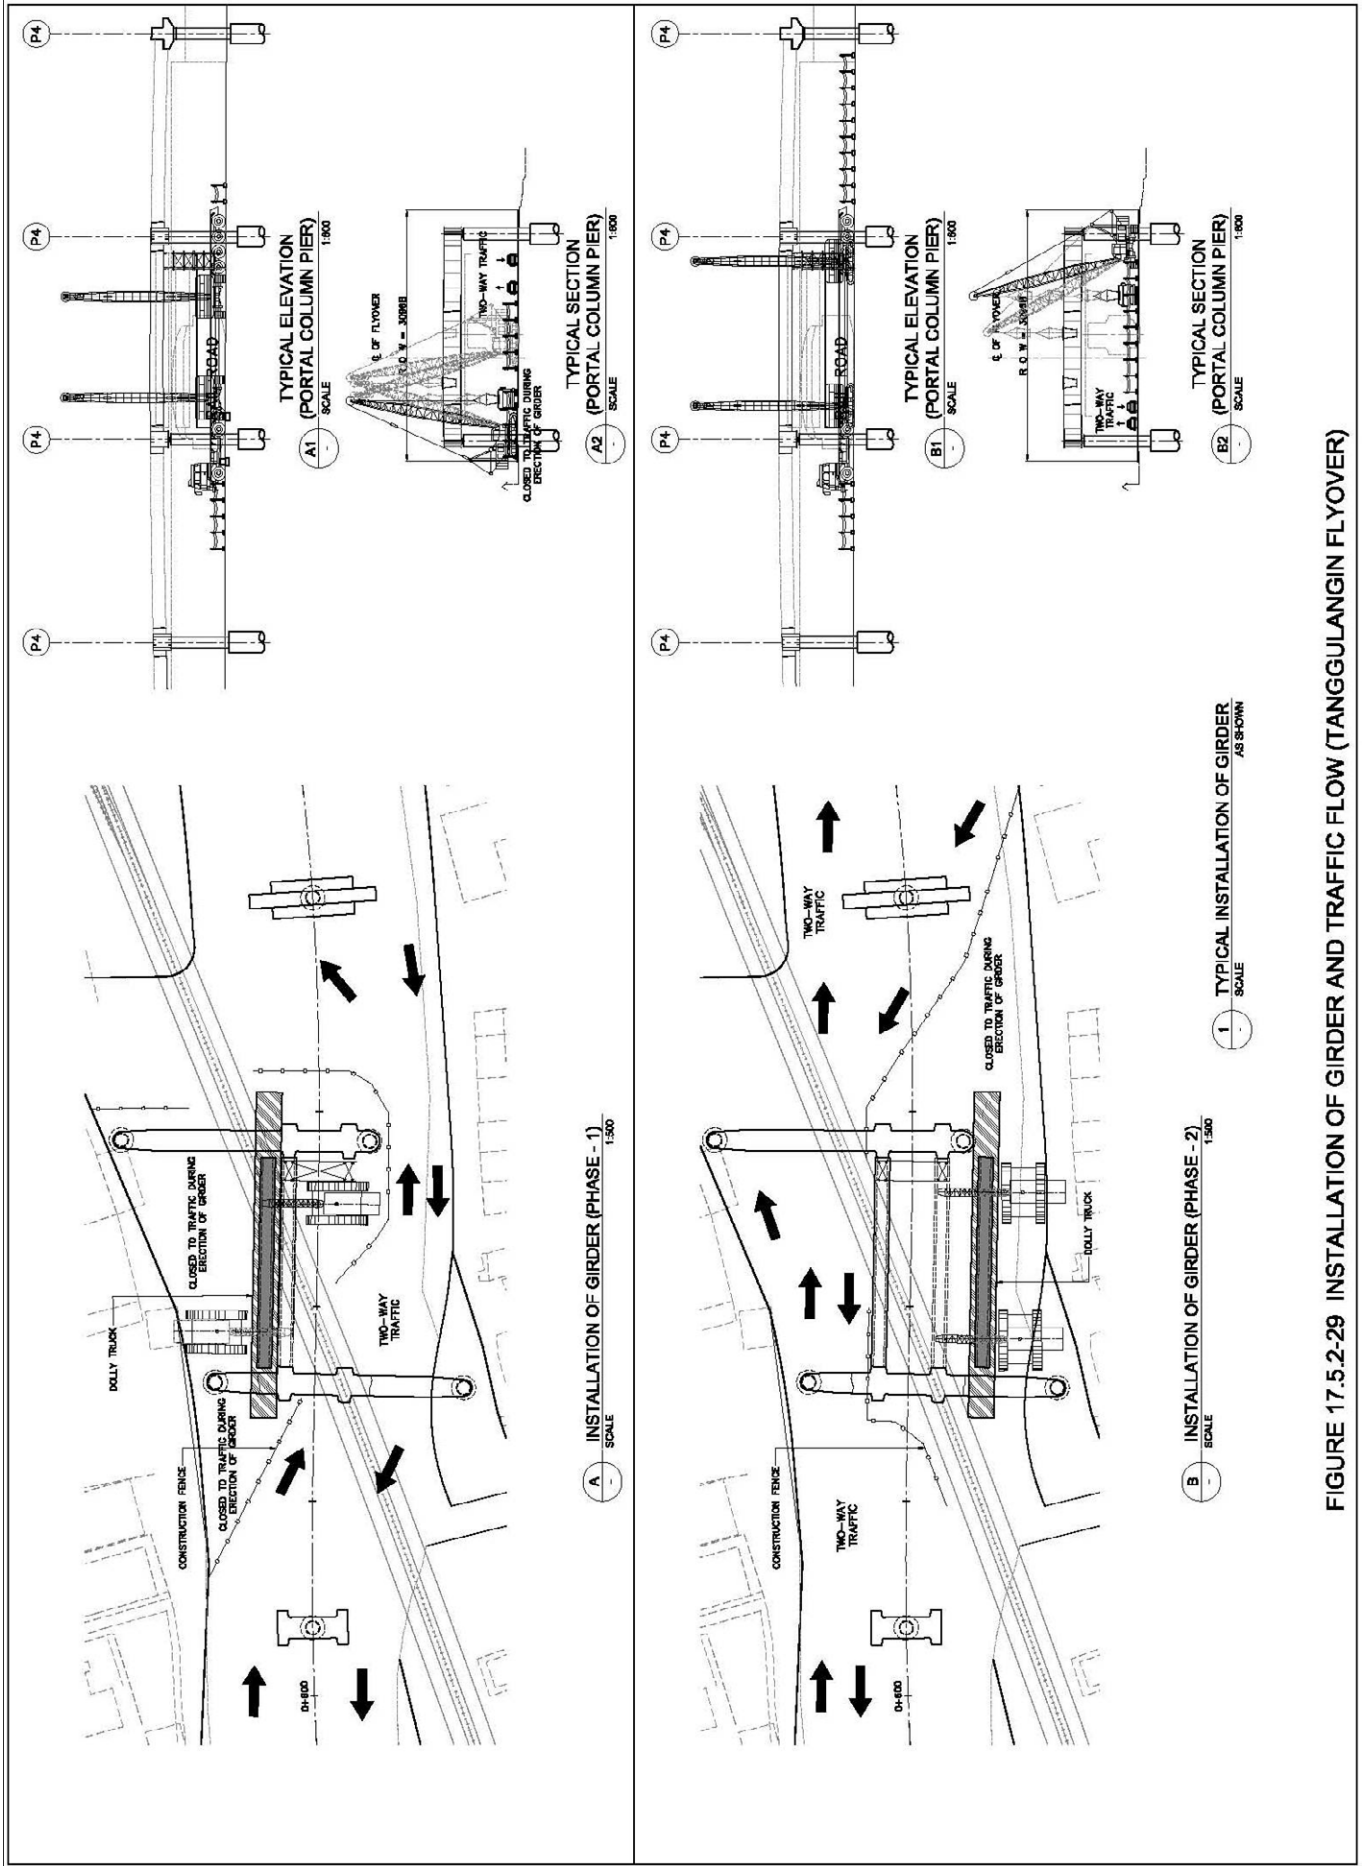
INSTALLATION OF GIRDER AND TRAFFIC FLOW (TANGGULANGIN FLYOVER)
